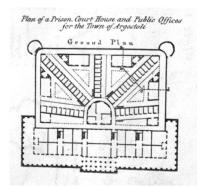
Plan of a Prison, Court House, and Public Office Building, Argostoli
